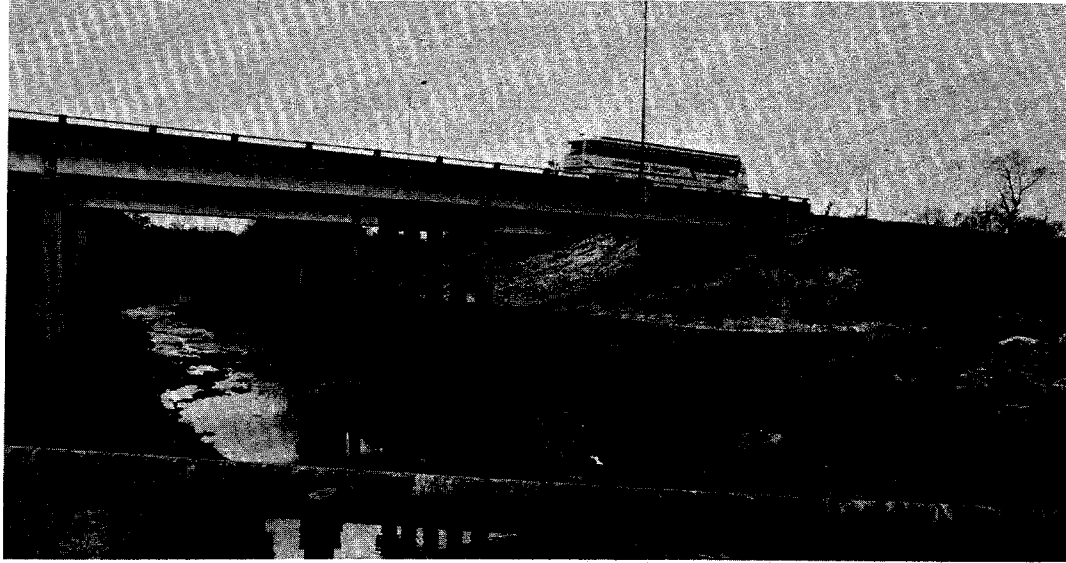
View of right abutment of I-12 bridge on February 18, 1977, showing steel sheet-piling driven to prevent slumping of fill-slope.
